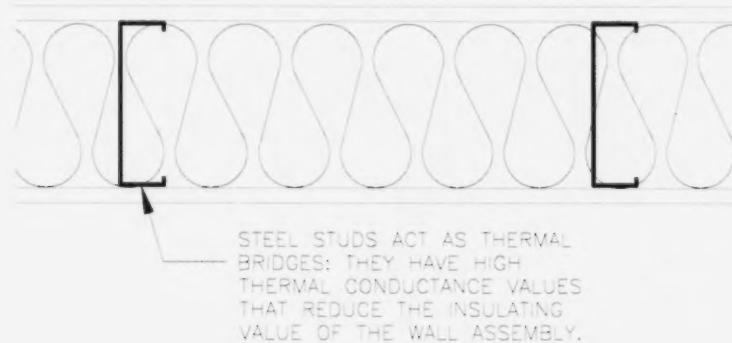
3 Steel Studs that Act as Thermal Bridges
